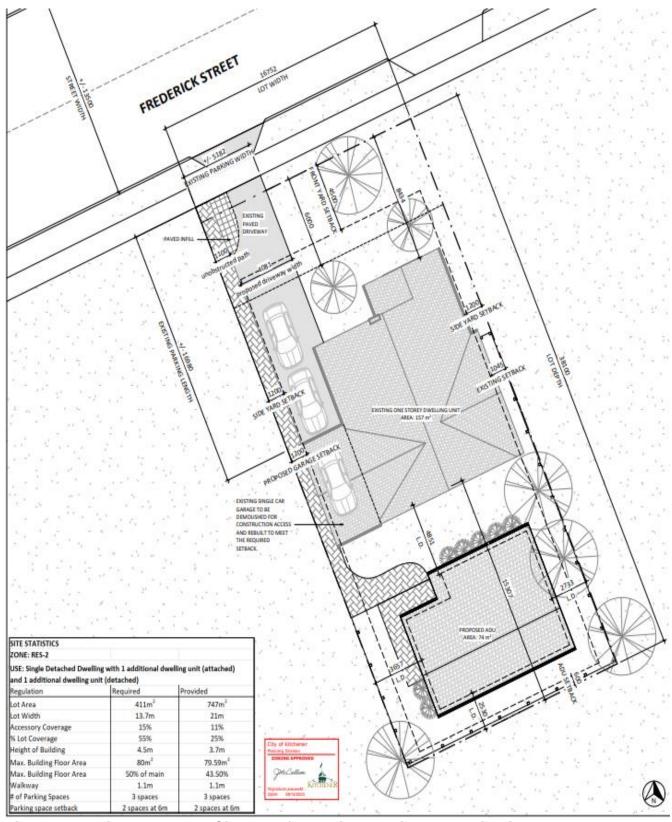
Zoning Approved Site Plan from Minor Variance Application A2023-082
